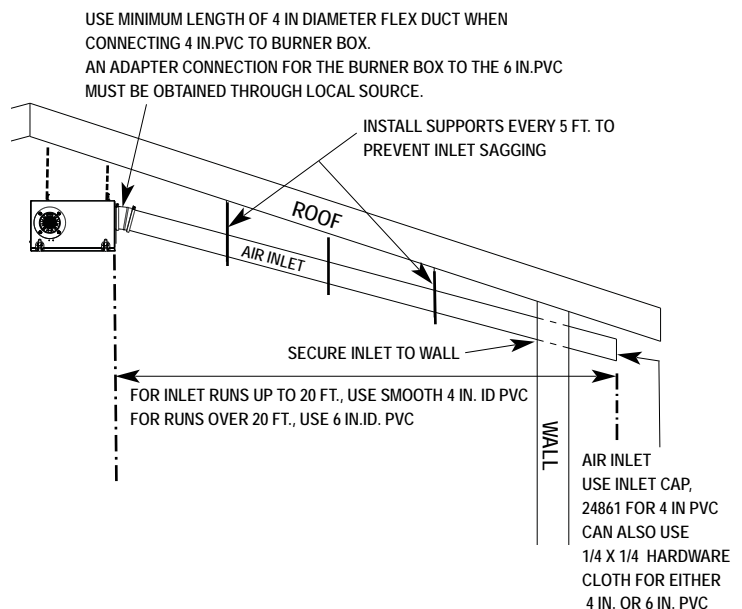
Drawing Inlet Air Through Side Walls - Overhead Heaters
